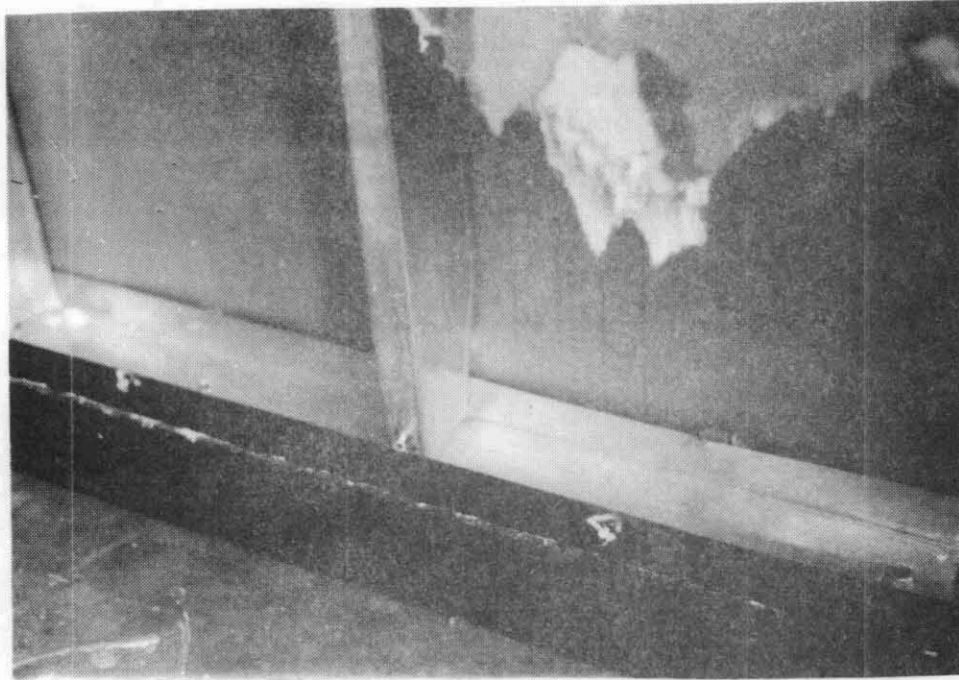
Partition Test Specimen P2A: Typical Interior Stud Failure
